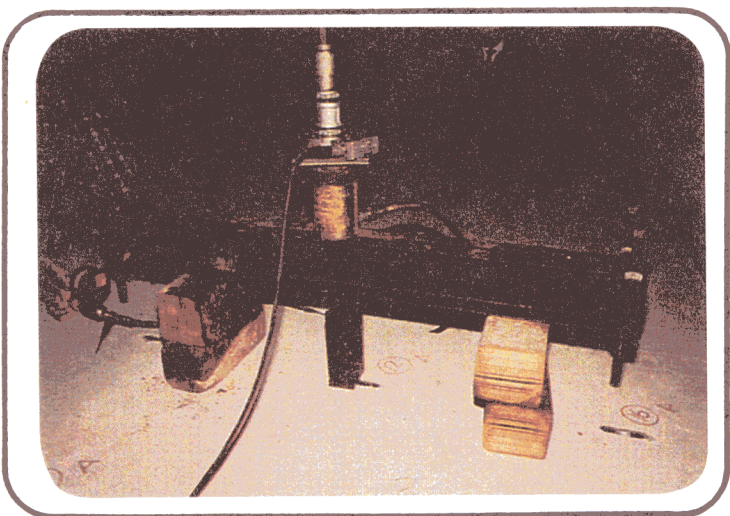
Test Set-Up showing 20 Ton Jack,
